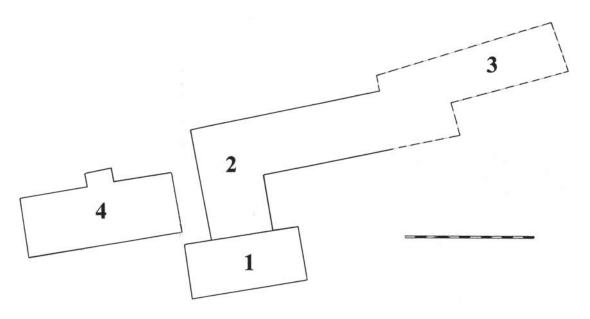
Block plan of site based on Ordnance Survey. Scale in metres
